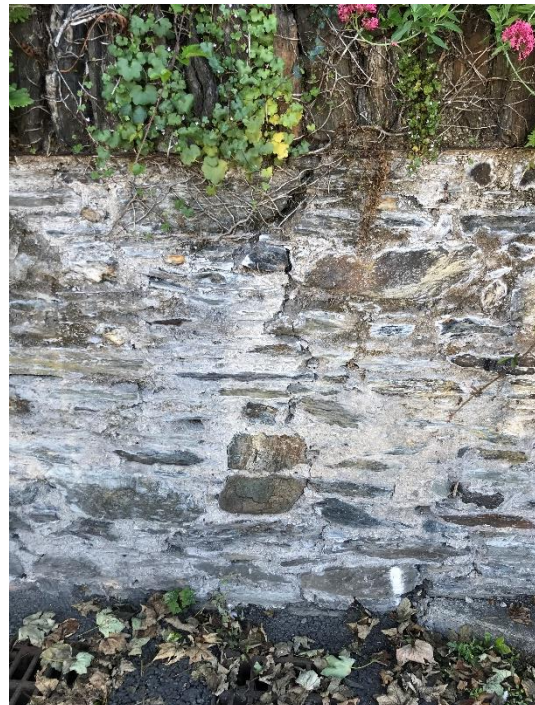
Boundary wall looking up Wentworth Place towards Abbey Street
